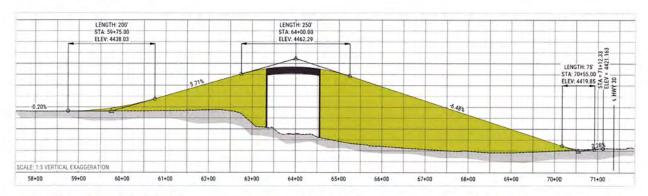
, BRIDGE PROFILE | LENGTHENING THE DISTANCE BETWEEN THE BRIDGE AND US-30 WILL BE IMPORTANT TO REDUCE THE STEEP ROADWAY GRADE.
